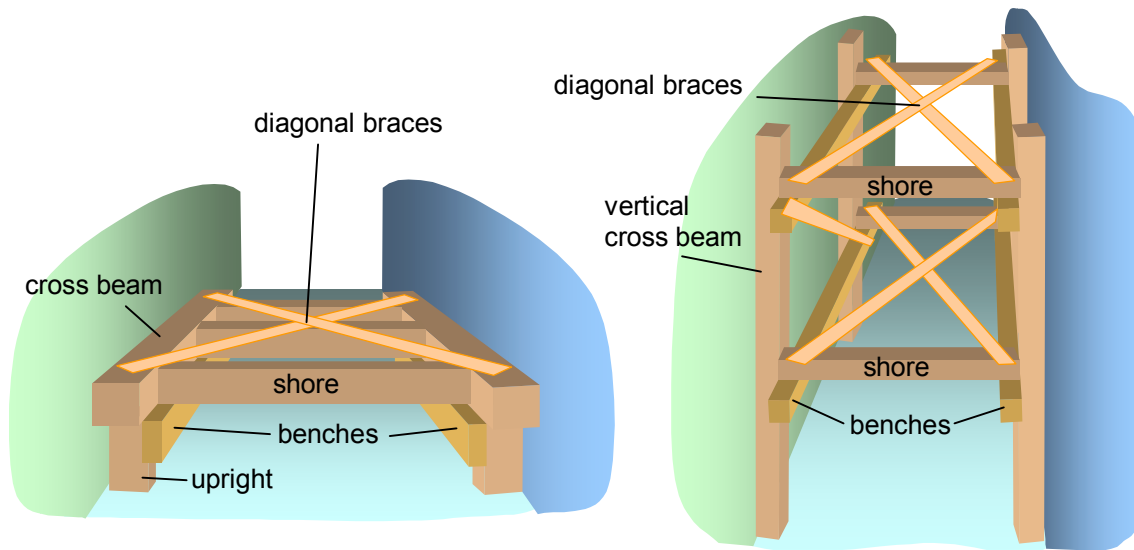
Timber shores with horizontal (left) and vertical cross beams (right)
